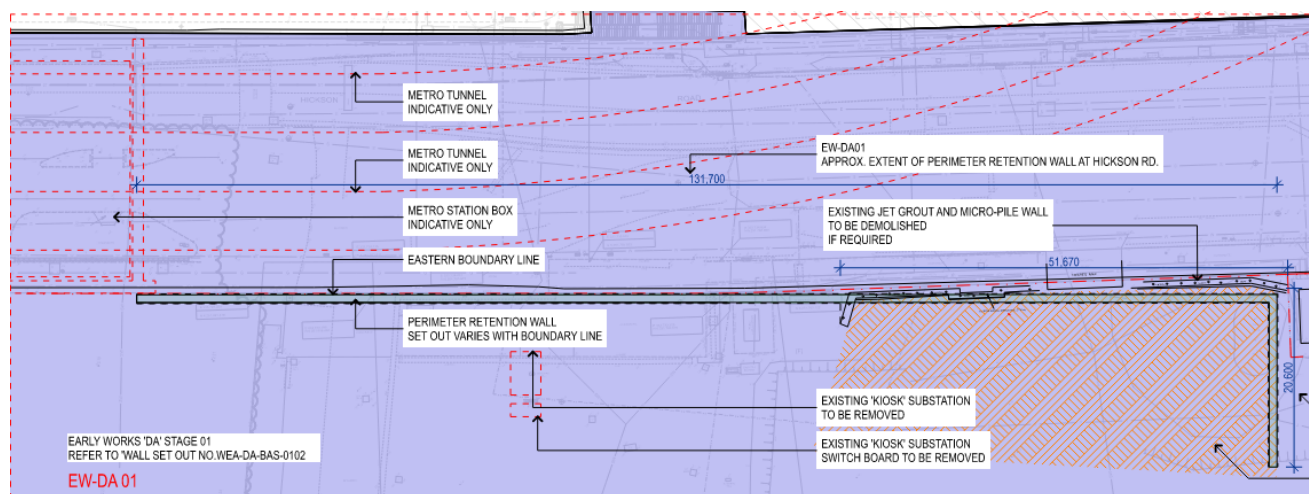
Early works Stage 1 - Perimeter Retention Wall Plan (source Webber).
